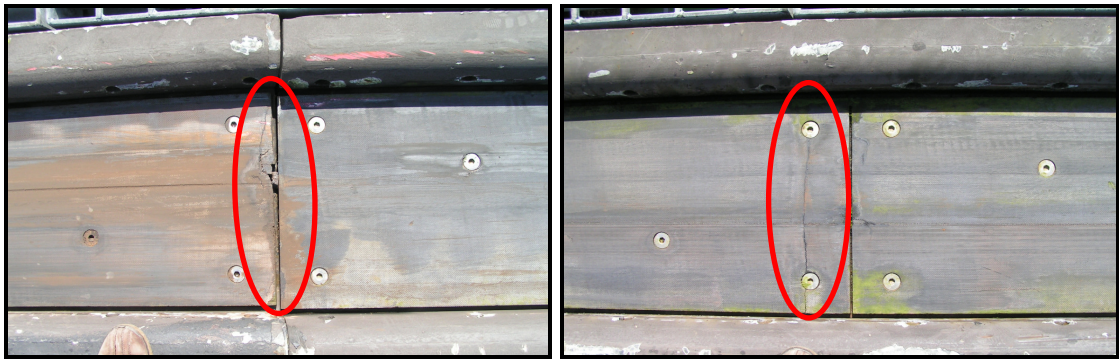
Padstow Slipway Inspection: Panel end wear
